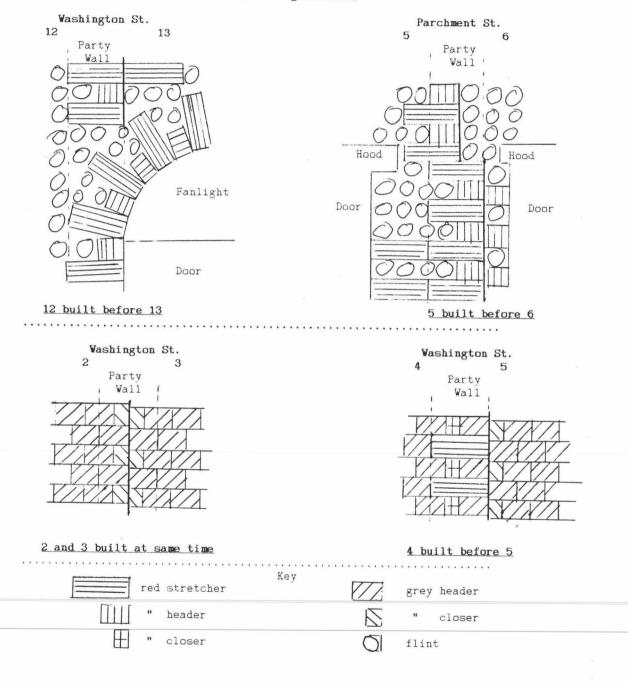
Straight joints in Washington Street and Parchment Street, Chichester.
